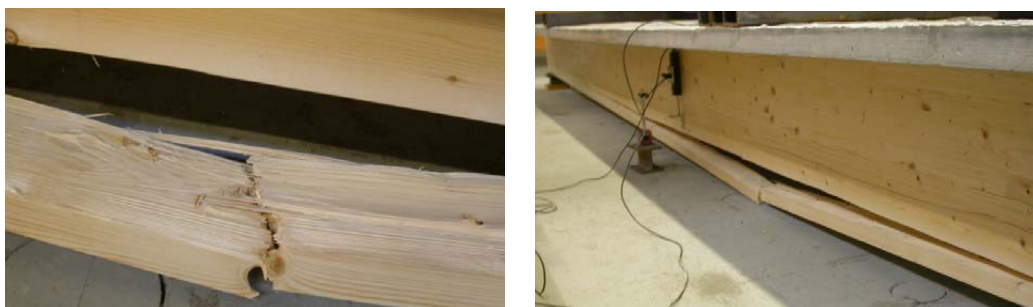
Failure of the office type specimen due to the breaking of the lowest lamella.
